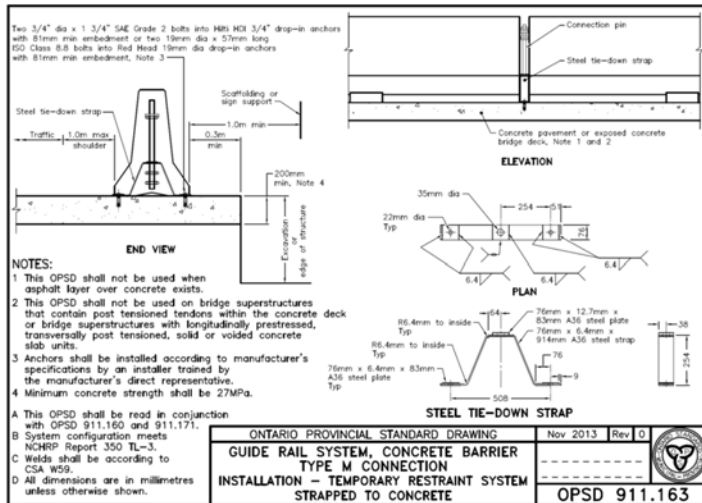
Standard Construction Drawing Type M Barrier Strapped to Concrete
